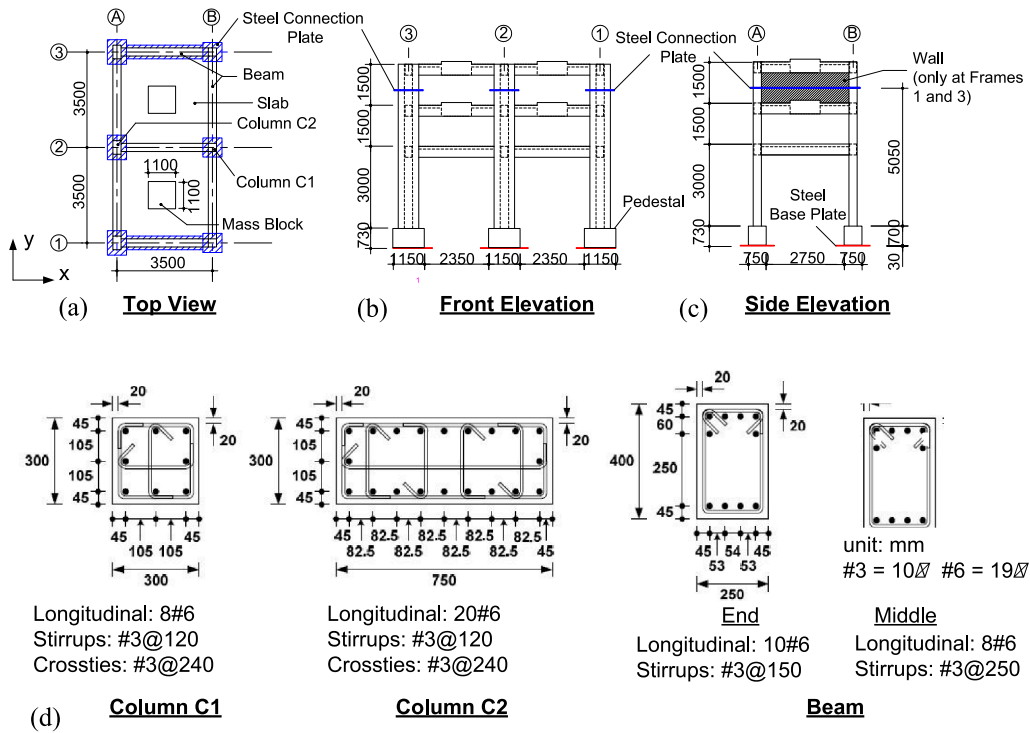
(a) Top view, (b) front elevation, and (c) side elevation of the three-story building; (d) reinforcement details of the beams and columns.
